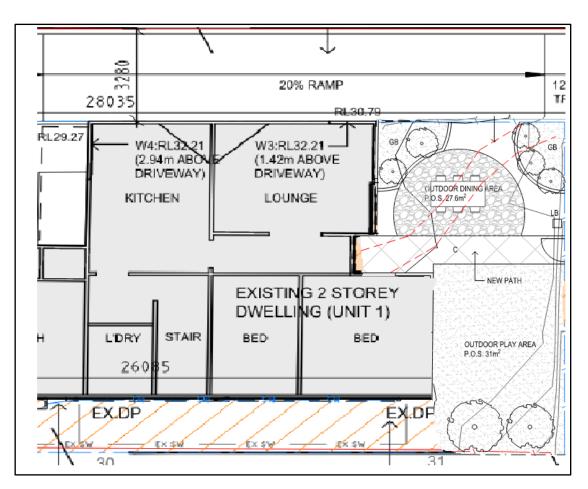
Composite image demonstrating the applicants' proposed arrangement of private open space for Unit 1 (not to scale).
